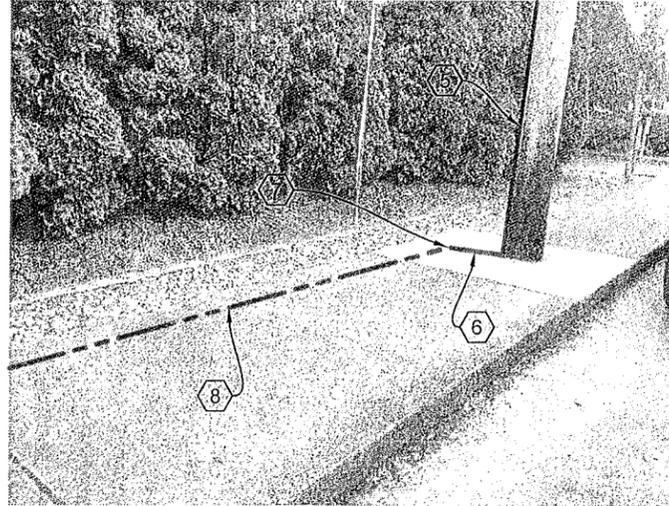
FACING EAST ON THE SOUTH SIDE OF WILDAIRE RD SW
